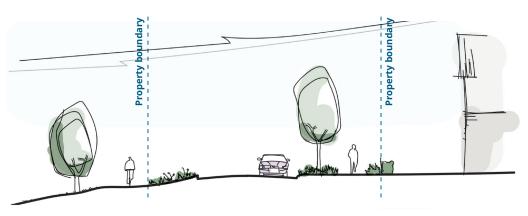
Cross section example - Secondary Road (open space edge) - 14m
